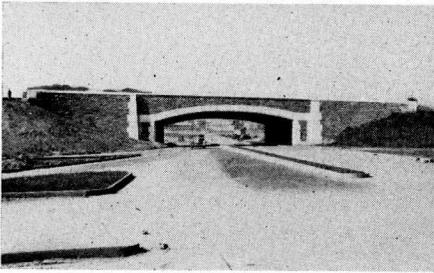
Bridge 7, a Single Span Rigid Frame Structure
